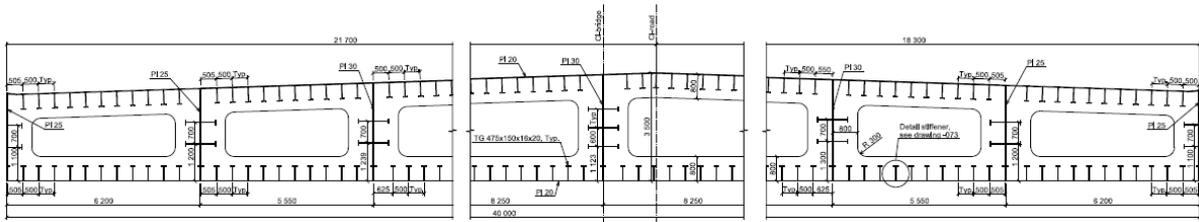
Strengthened bridge girder section at bridge ends at abutment North (truss bracing of cross stiffener not shown)
